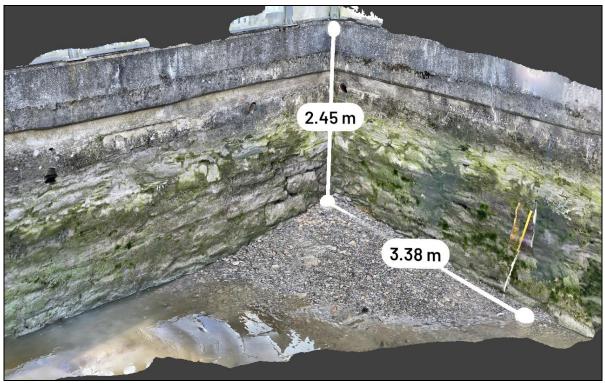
3D-elevation model of masonry quay wall with raised shingle beach, facing east-southeast
